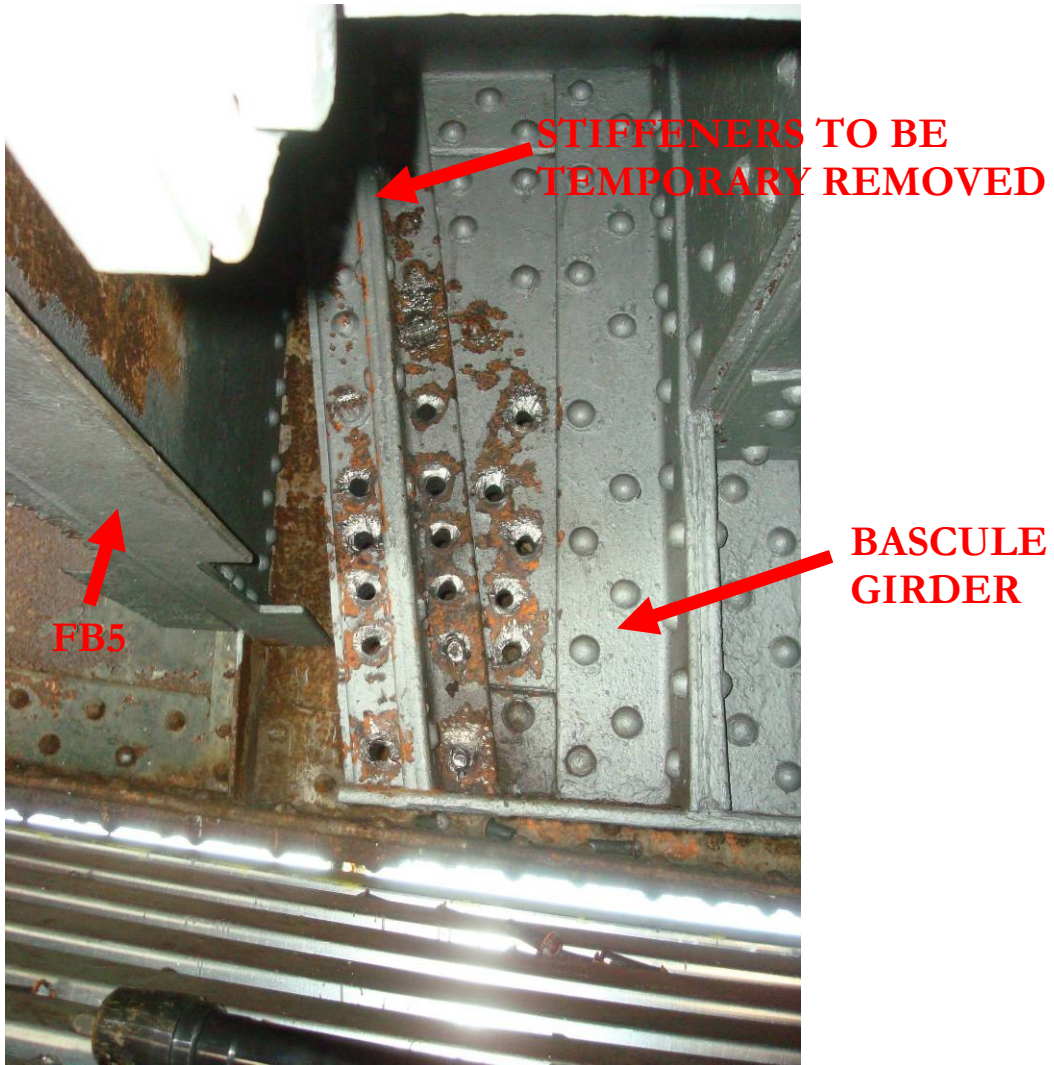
East Bascule girder and Floorbeam FB5, Removal of existing rivets and vertical stiffener angles required for temporary tie down. West Bascule girder similar.
